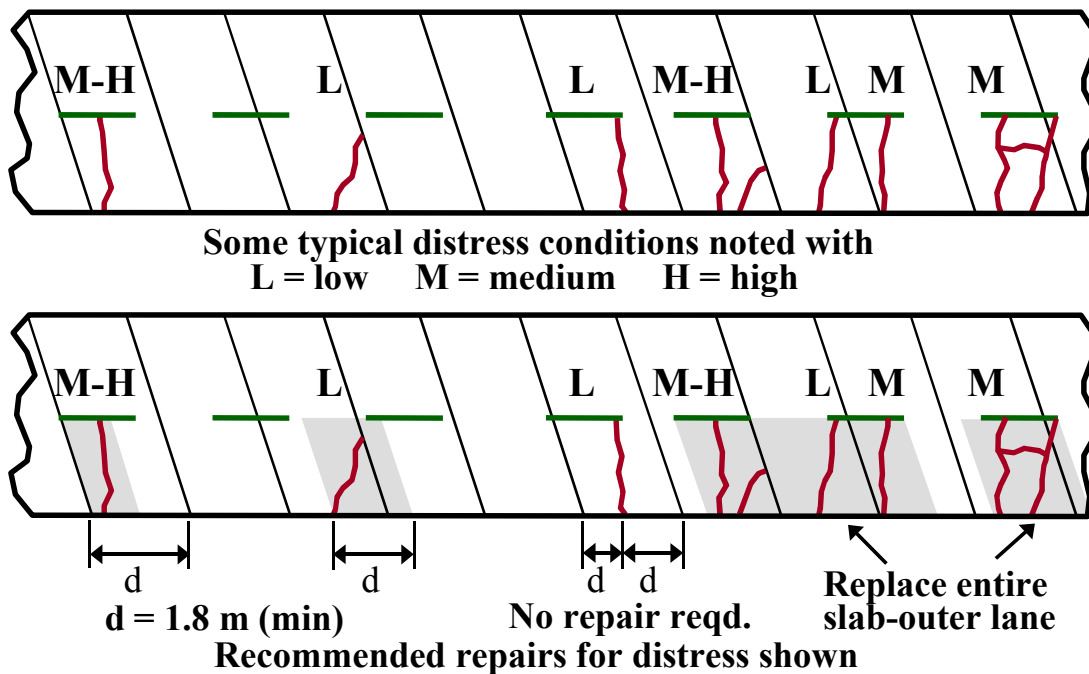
Selection of full-depth repair boundaries for jointed plain concrete pavement.⁴
